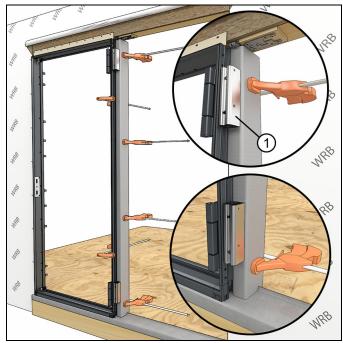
Clamp tube steel to frame against aluminum mull filler blocks.
